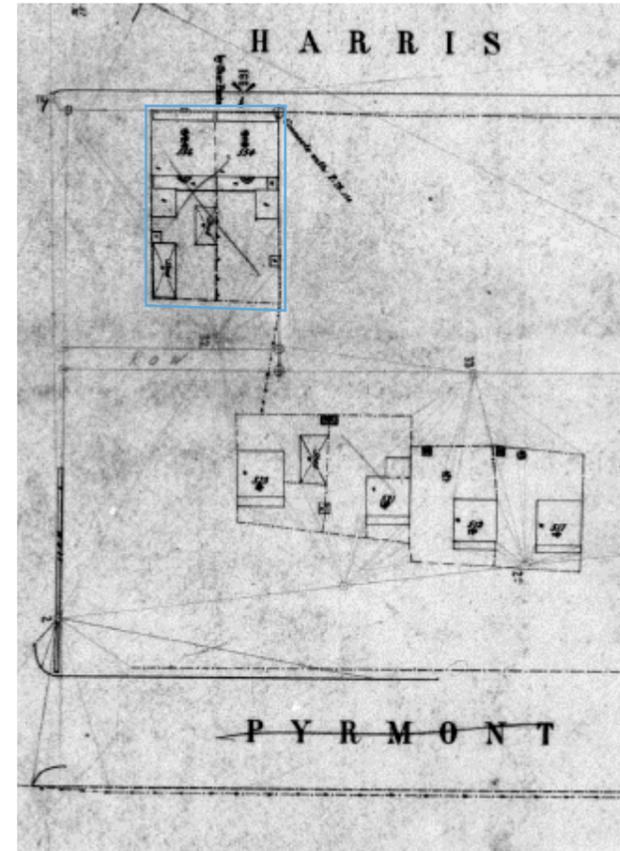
Detail from 1886 plan showing houses at 554–556 Pyrmont Street (Source: Sydney Water PWDS 1544-S206)
